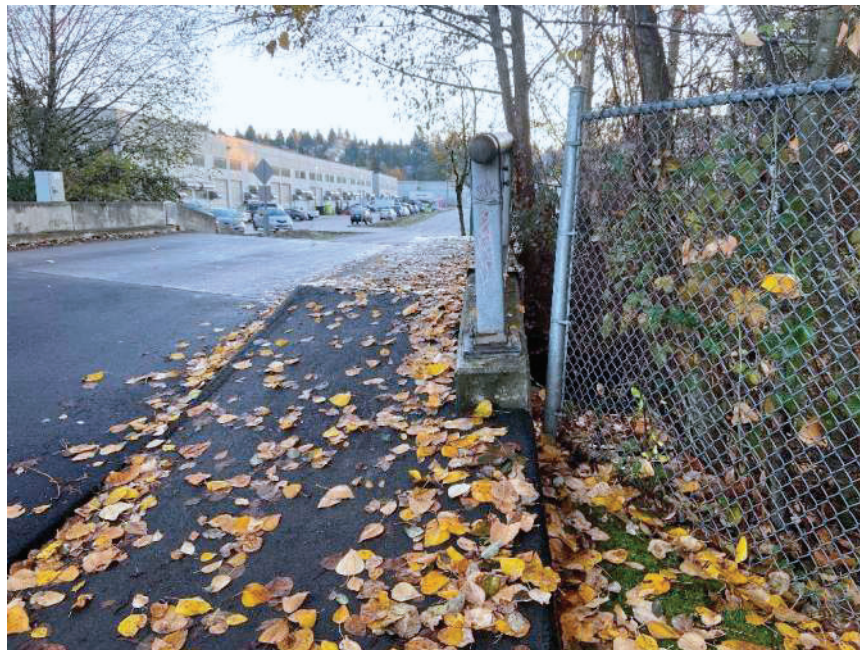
Schoolhouse Bridge – City Facility located immediately southwest from bridge.
